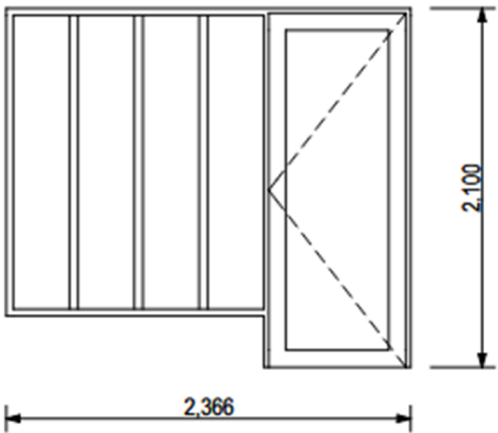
Elevation of the proposed glazed door and sidelight windows.
